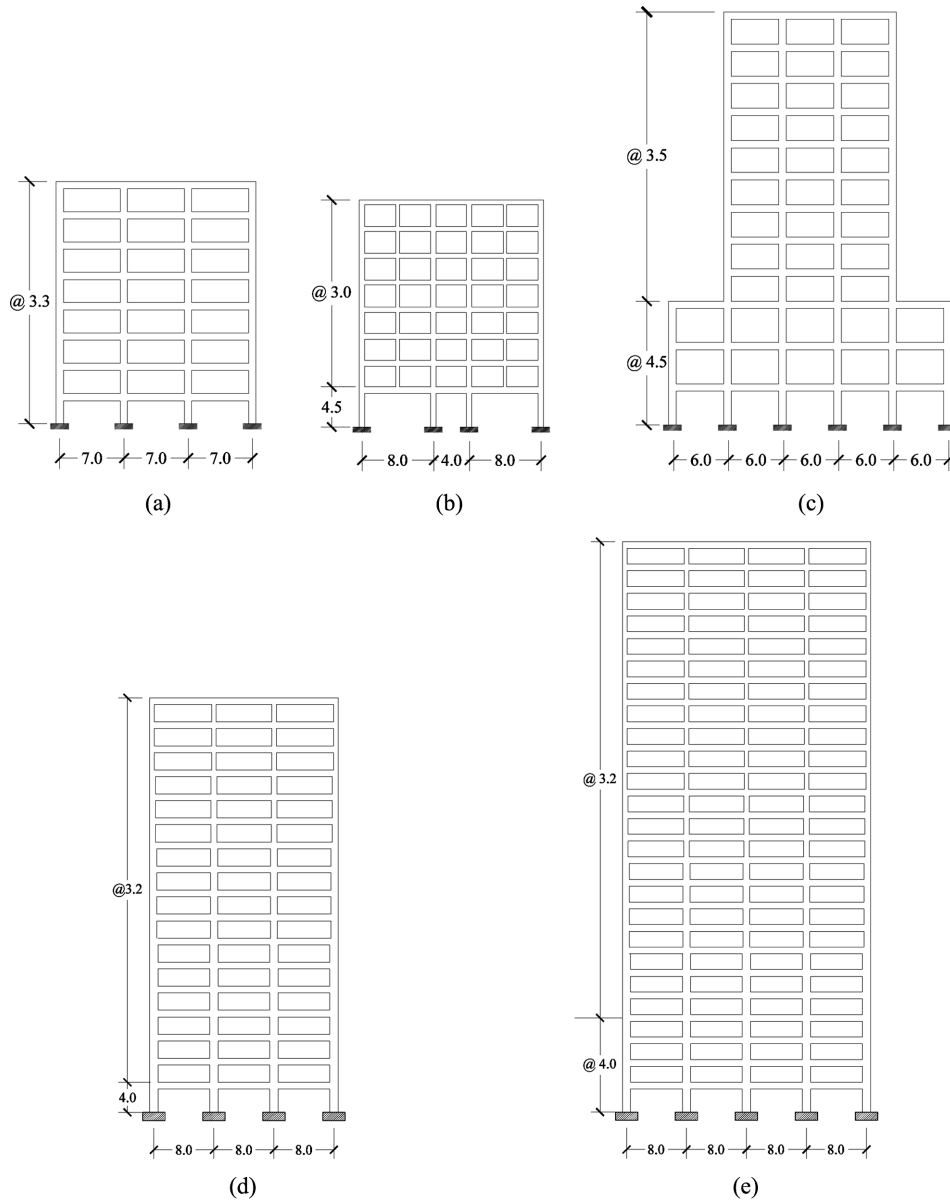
Geometry of the example frames: (a) 8 storey frame, (b) 8 storey irregular frame, (c) 12 storey irregular frame, (d) 17 storey frame and (e) 25 storey frame
